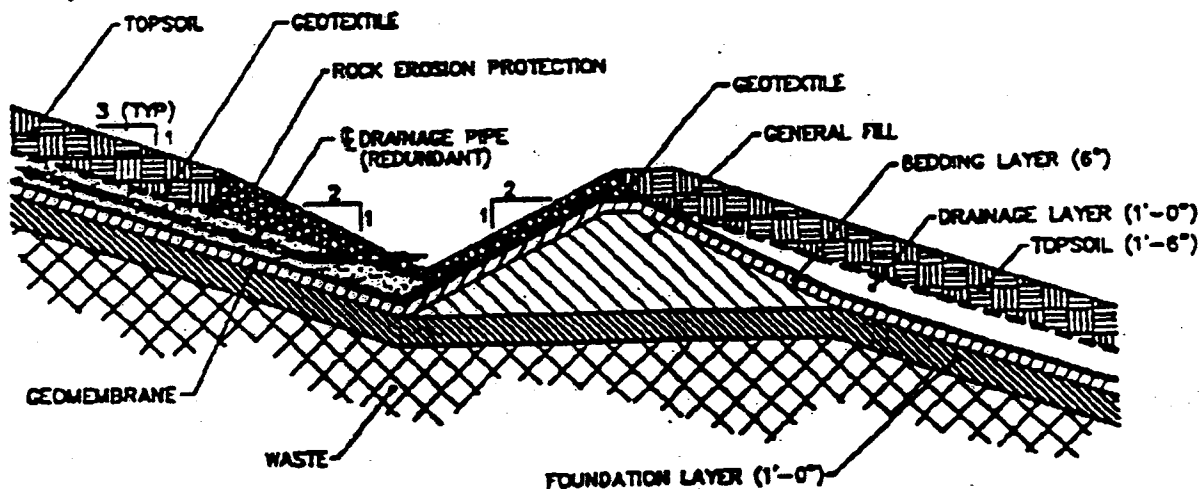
TYPICAL LANDFILL COVER SECTION WITH GEOMEMBRANE BARRIER LAYER AND INTERMEDIATE BENCH DITCH
